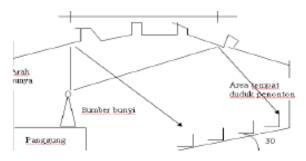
Recommended Floor Slope (Source: Doelle, 1990)
